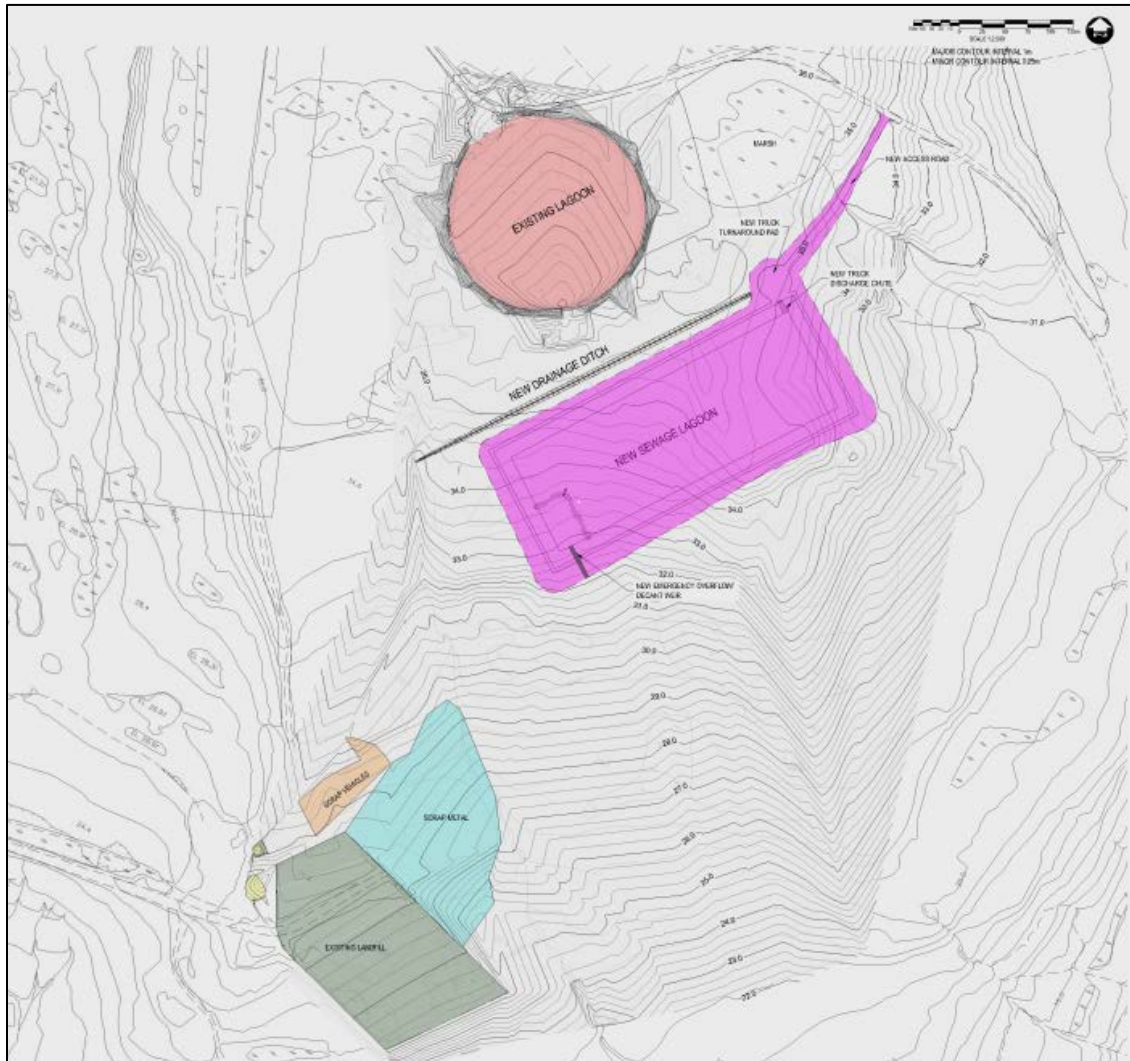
Gjoa Haven Sewage Lagoon Site Location
